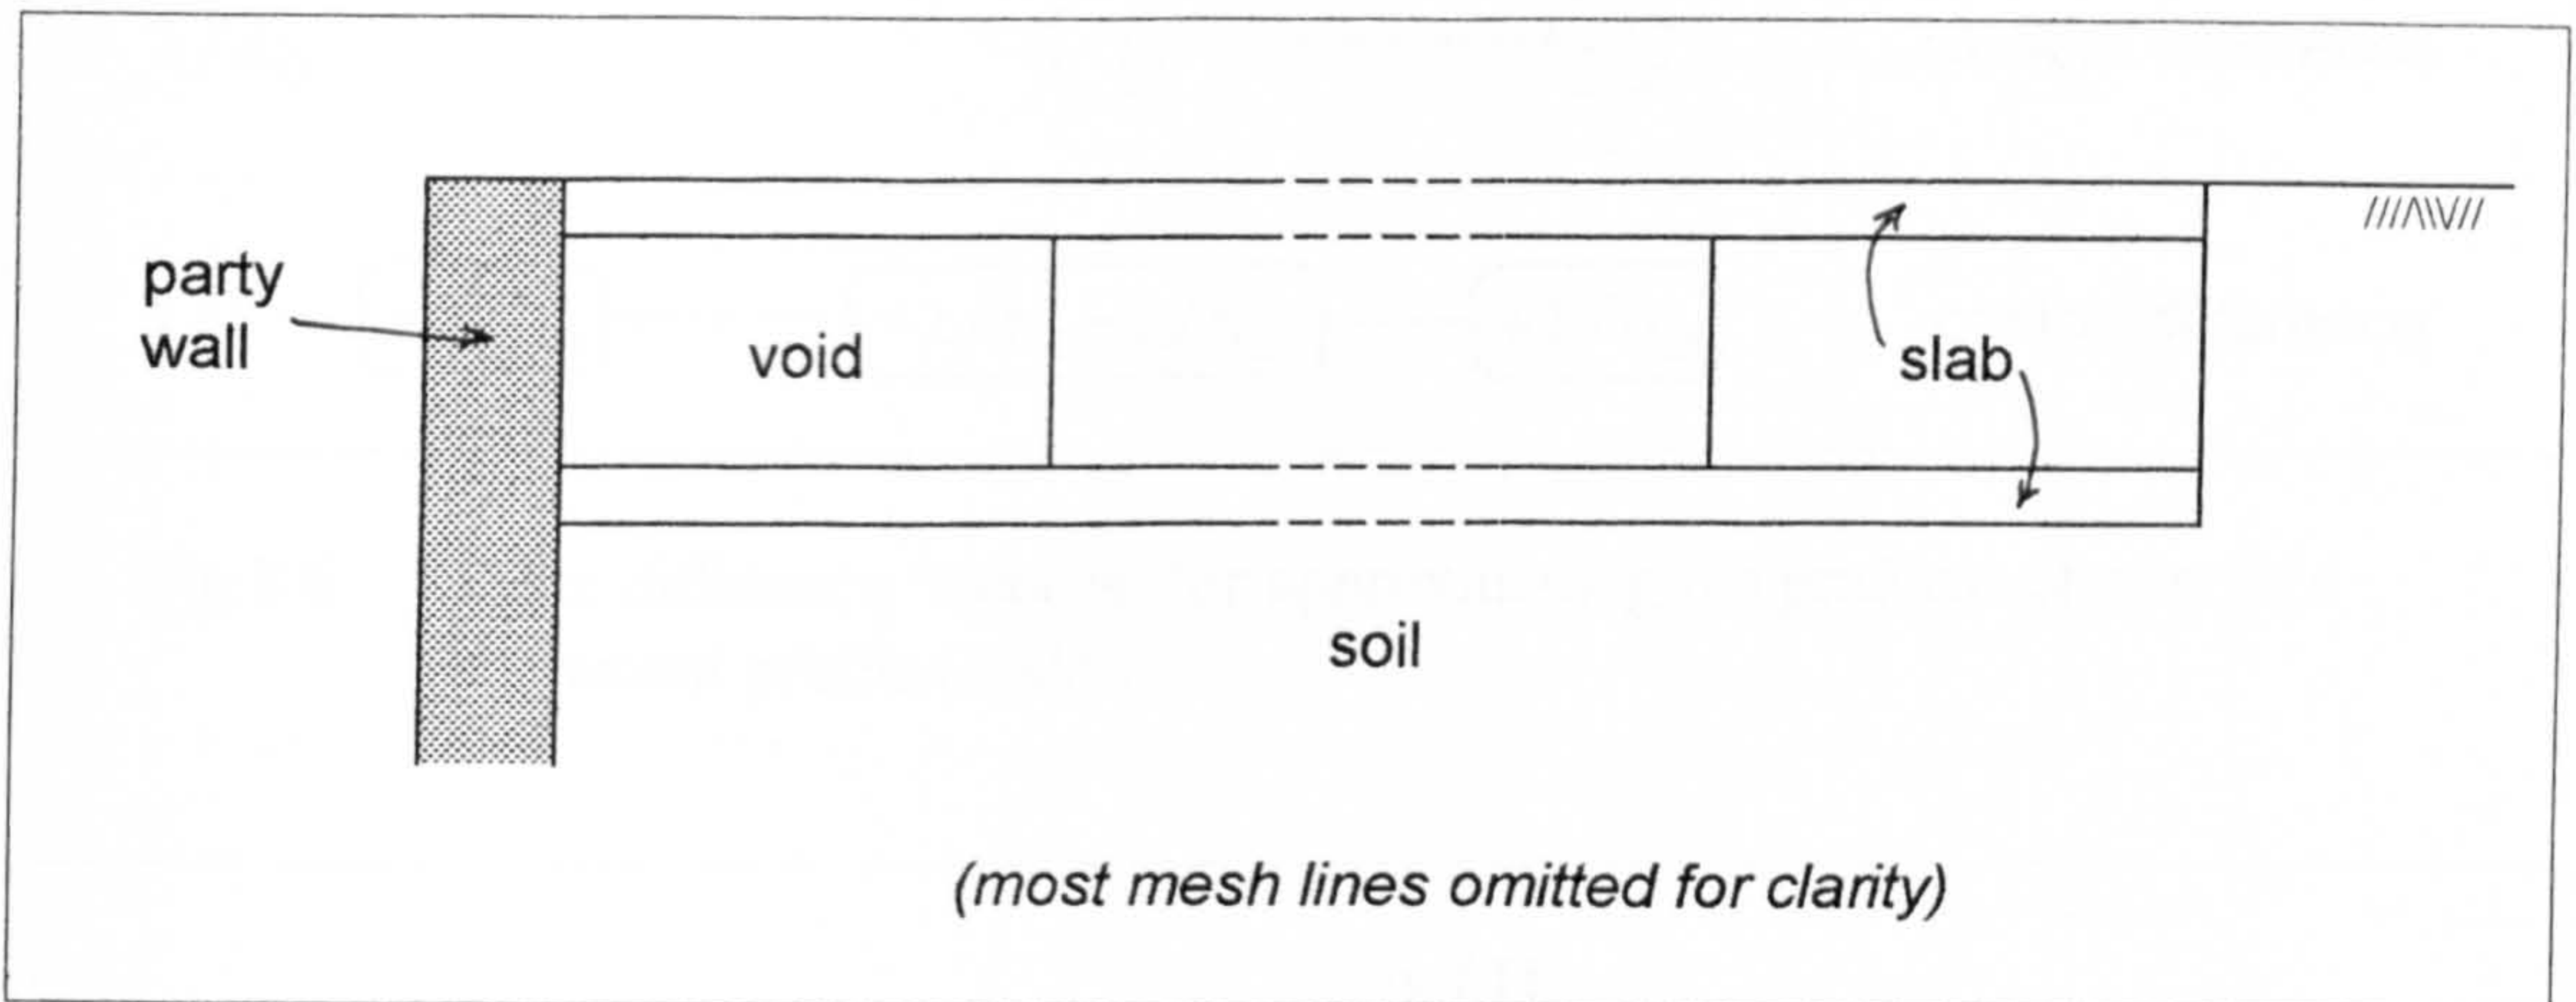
Queensberry House - mesh detail near party wall and adjacent basement
